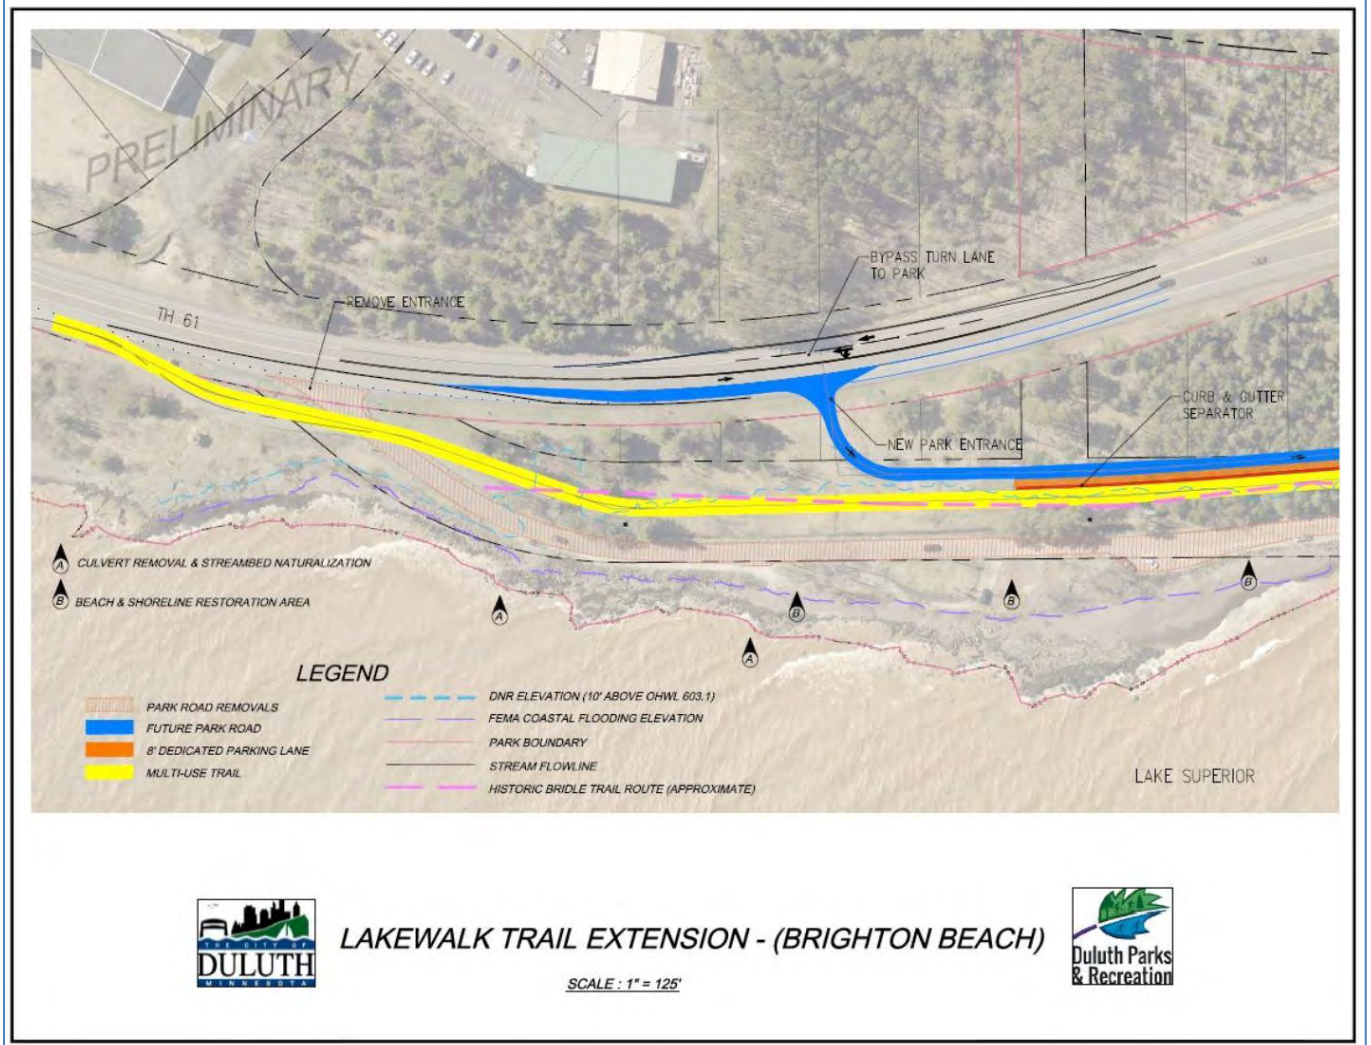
Preliminary proposed roadway realignment, view of Kitchi Gammi Park and Brighton Beach Road. New roadway indicated in blue. Trail extension indicated in yellow.
